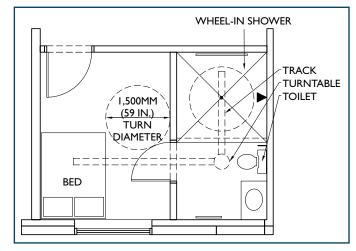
Plan view of ceiling lift installation Diagram by Ron Wickman, Architect
